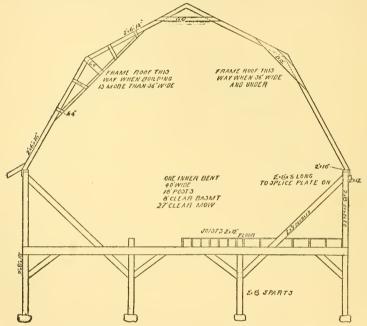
Section through a Wing joist frame barn in Worcester County, Mass. Gives plenty of storage and room for an excellent stable beneath.
